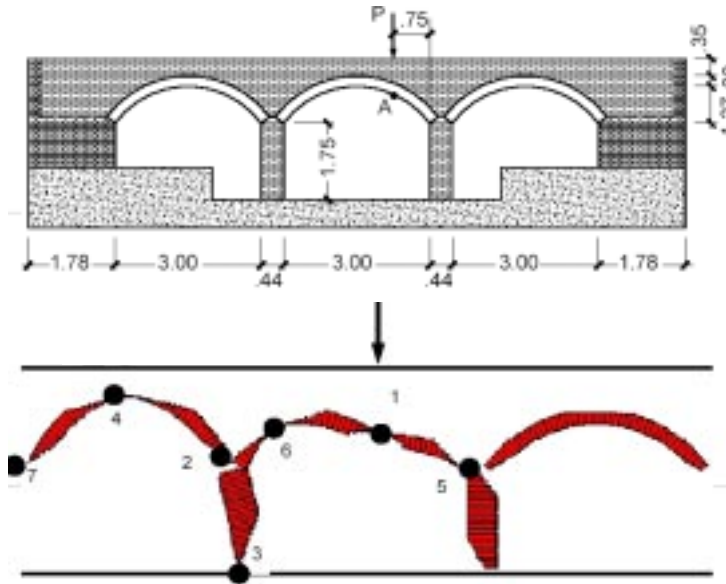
(e) multi-span: 8 hinges (interaction between spans through spandrel zone)
